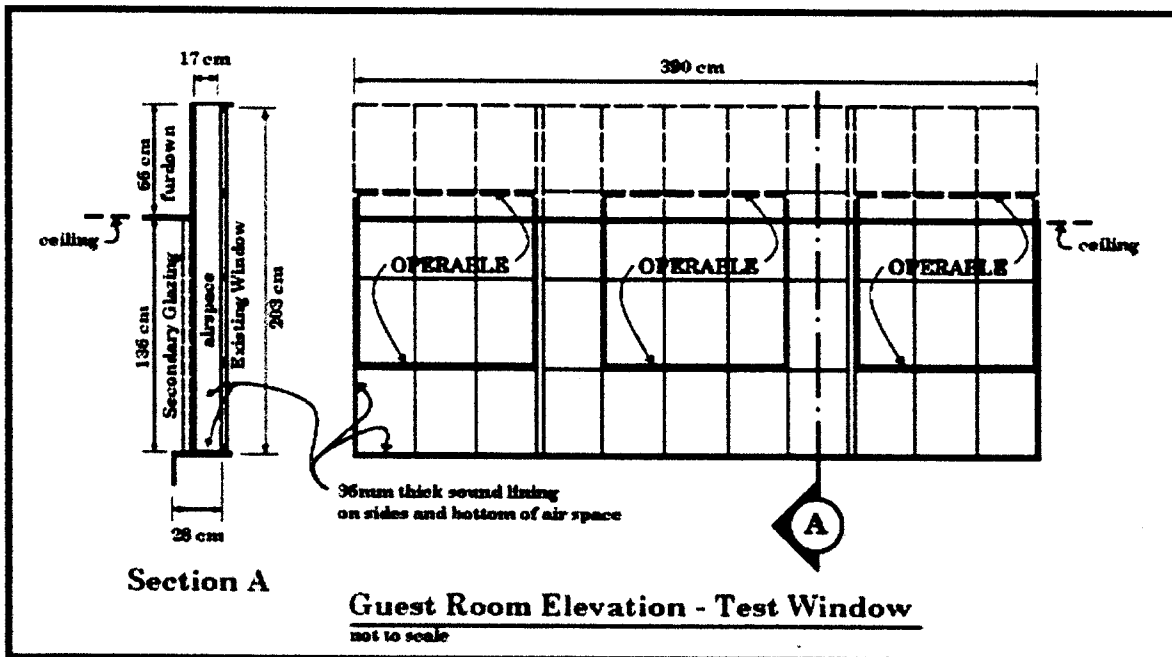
CROSS-SECTION VIEW (LEFT) AND ELEVATION (RIGHT) OF THE TEST WINDOW
